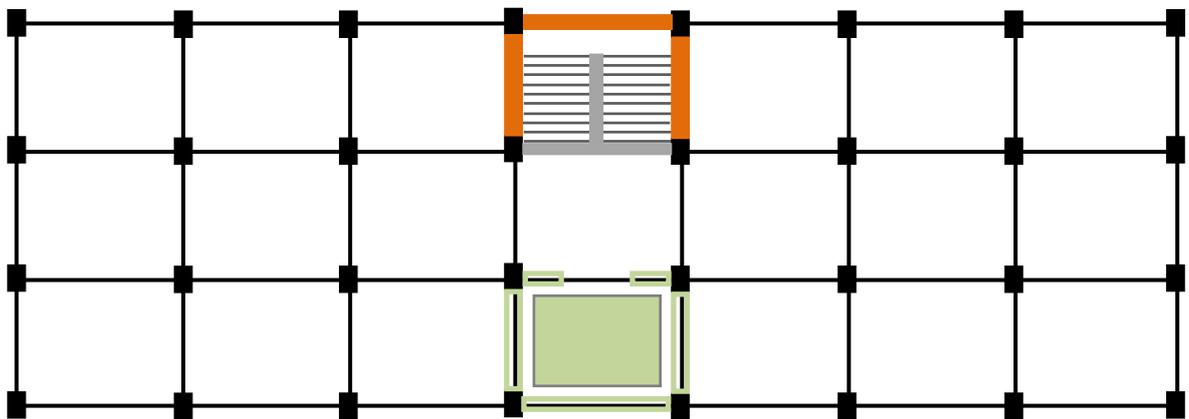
Retrofitting scheme of complete open ground storey(Murty, 2006)
